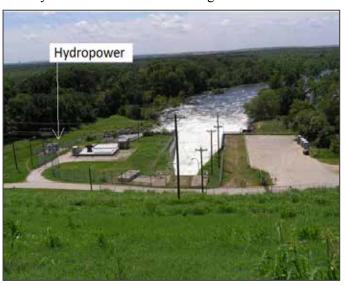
Lewisville Dam: Downstream View of Stilling Basin and Outlet Channel
